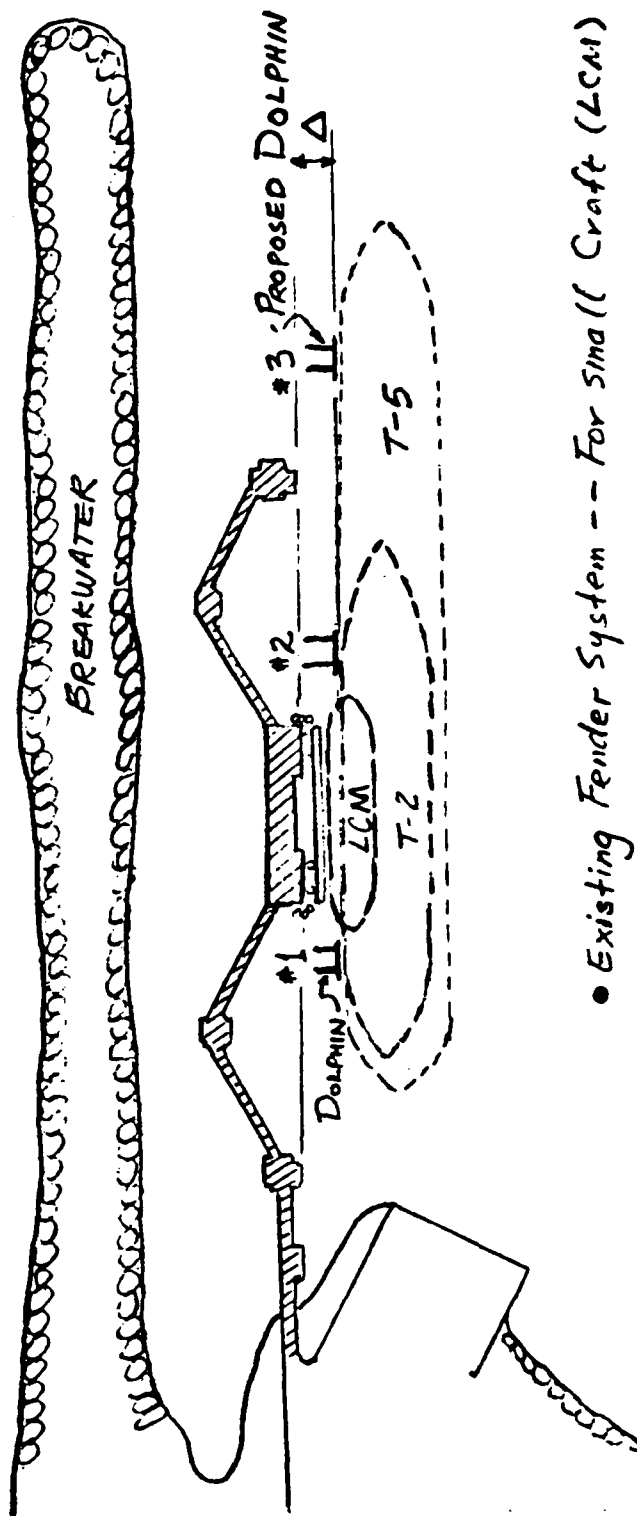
PROPOSED FENDER SYSTEM IMPROVEMENT
